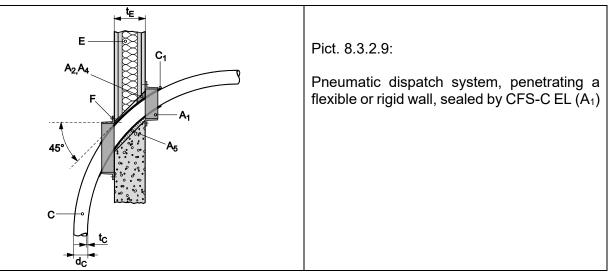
Pneumatic dispatch system, penetrating a flexible wall / rigid wall
